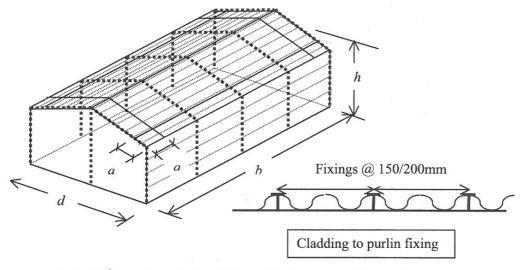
Low-pitch ($<10^{\circ}$) building with height (h), width (d), to length (b), showing roof edge regions and typical frame and purlin layout, purlin-frame connection and cladding fixing
